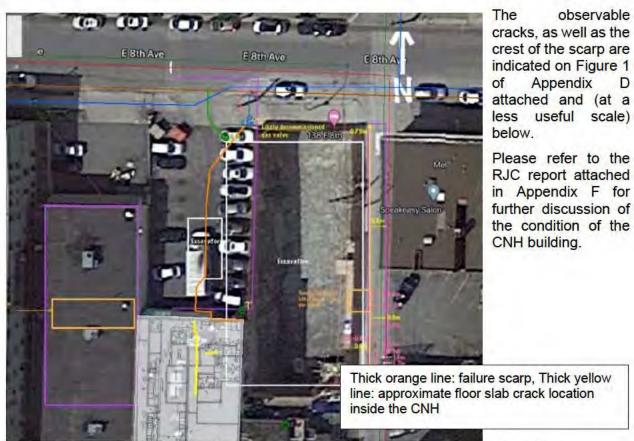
Aerial photo overlain by GeoScan utility locate site plan and floor plan of the CNH
